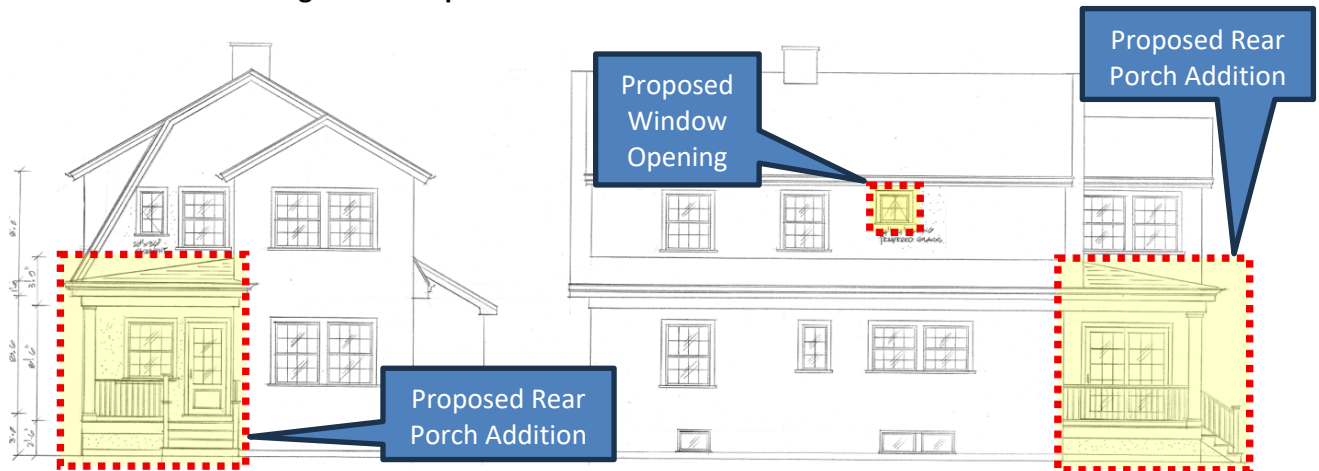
Proposed Rear (South) and Side (West) Elevations
